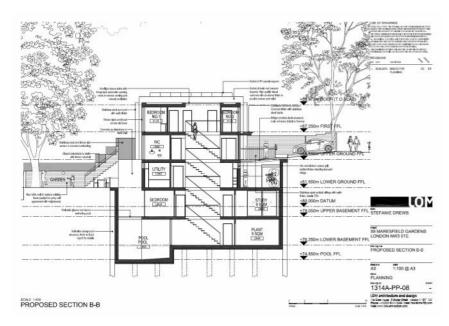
Proposed section B-B. NTS. Source: LOM Architecture and Design (2015).
